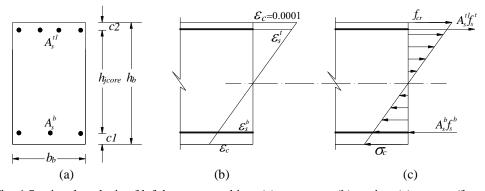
Sectional analysis of left beam at cracking: (a) geometry; (b) strains; (c) stresses/forces
